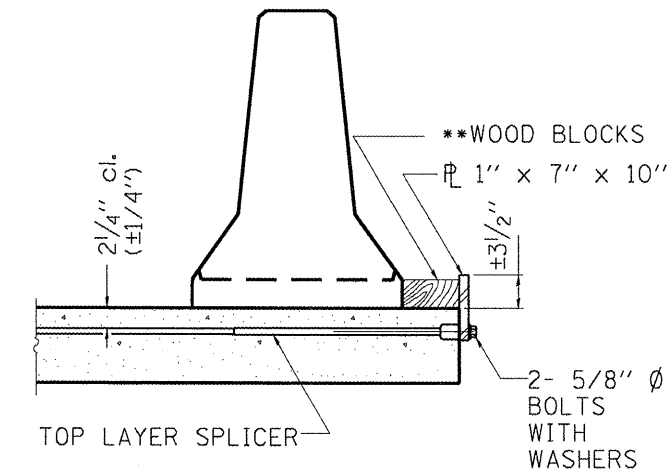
DETAIL I - WITH BAR SPLICER OR COUPLERS:
